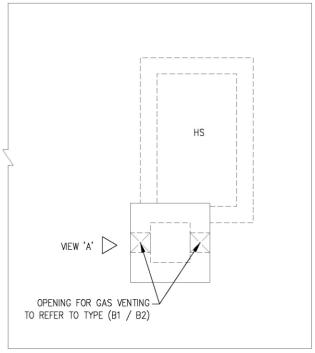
(i) REQUIREMENTS FOR PROTRUDING OF RISER ABOVE THE ROOF (TYPE A)
